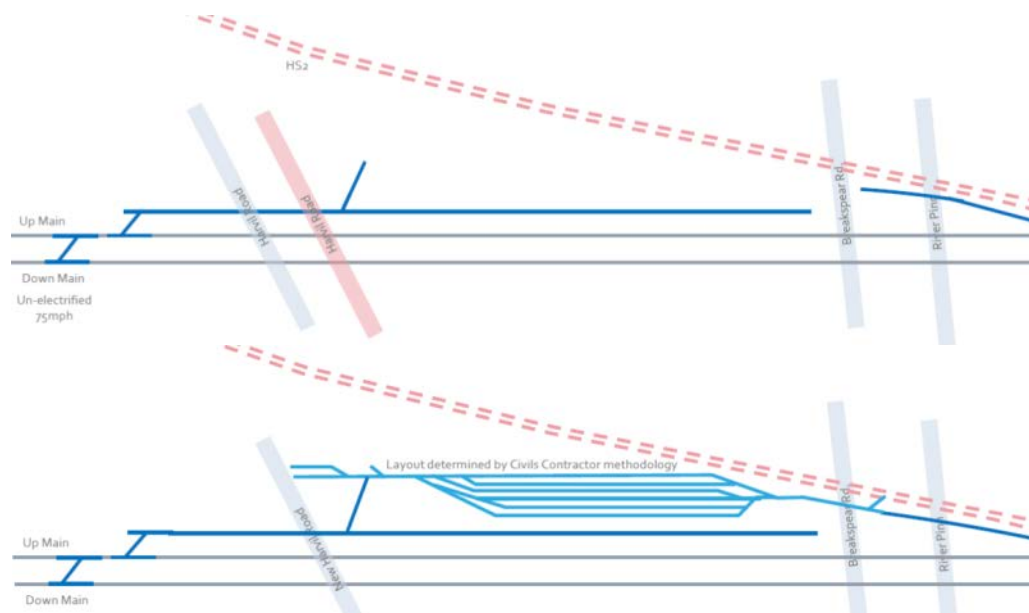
Full EM Railhead – following completion of new Harvil Road Bridge
